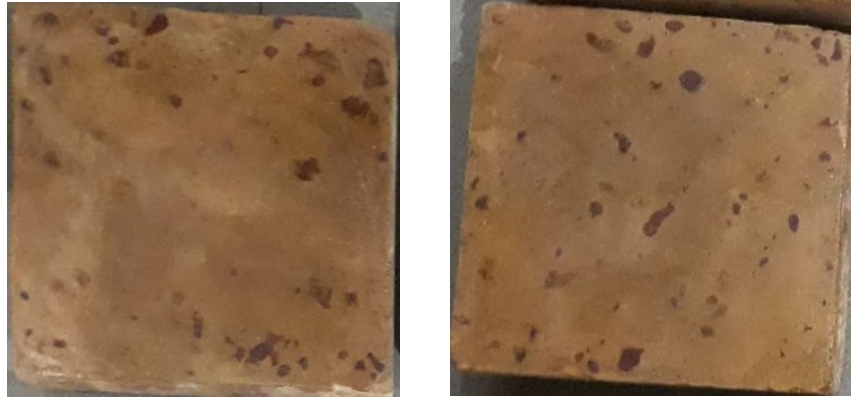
Appearance of soil floor, (top surface finished with a floor sealer)
